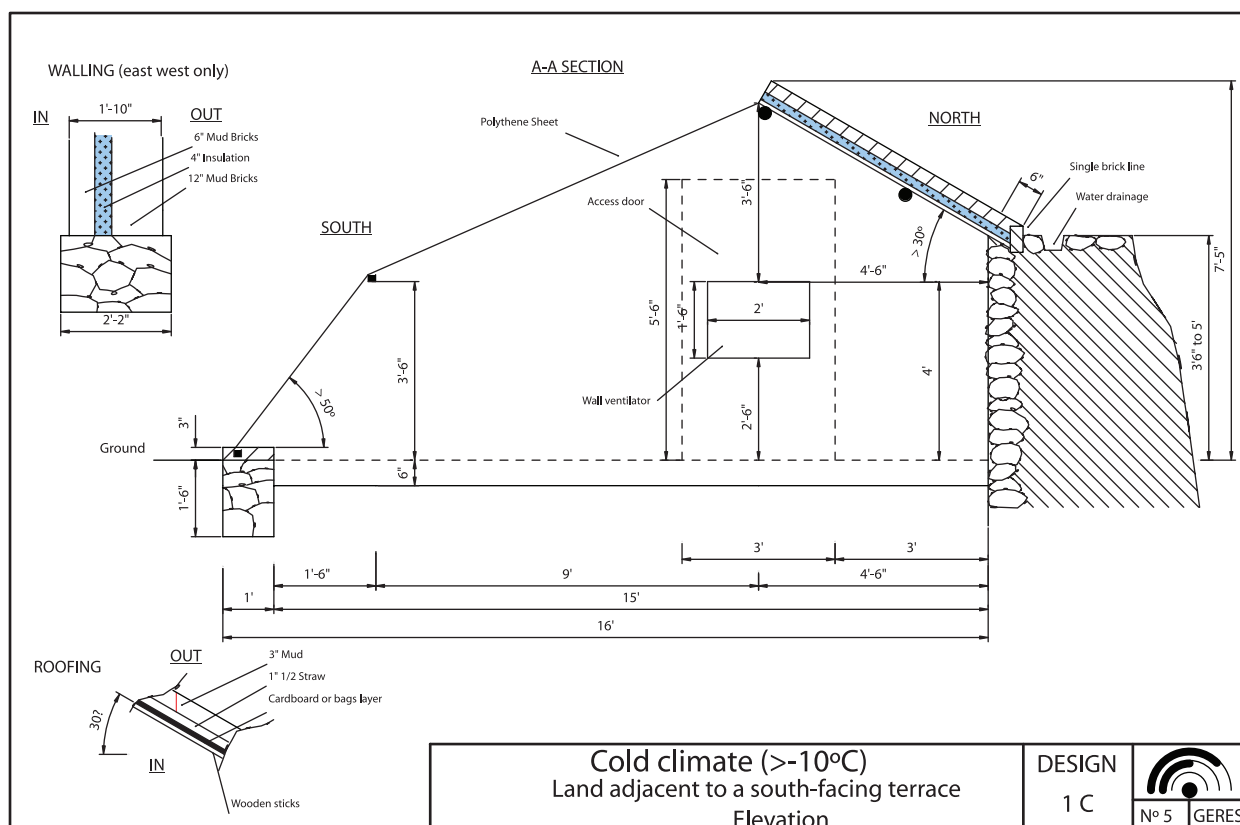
Design 1C - Greenhouse for cold climate, site adjacent to a south-facing terrace wall
